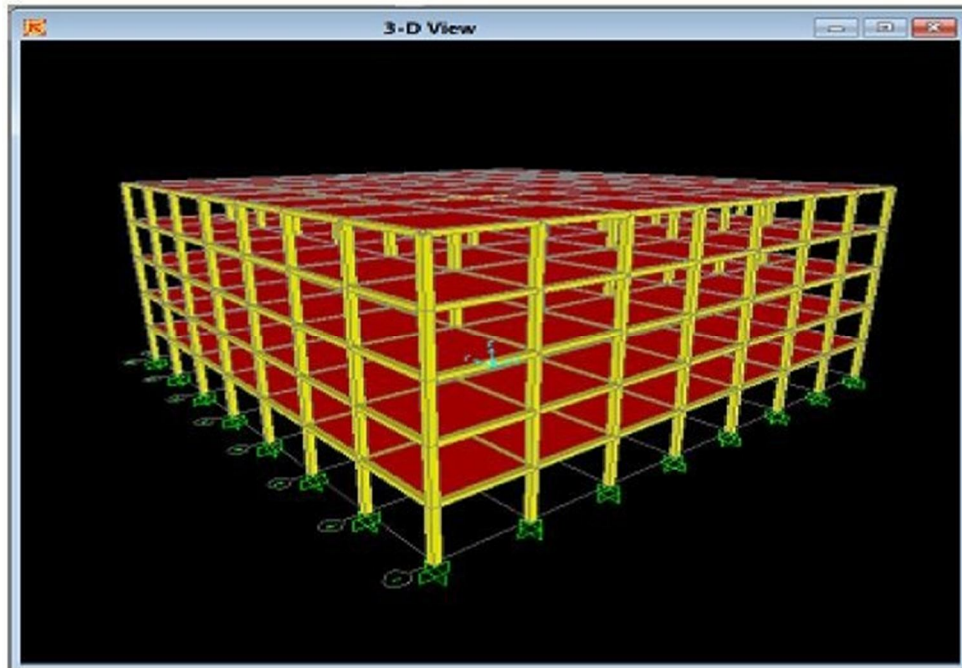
Three-dimensional extruded view of the G+4 RC frame model in SAP2000, showing the 7×7 bay configuration and five-storey elevation.
